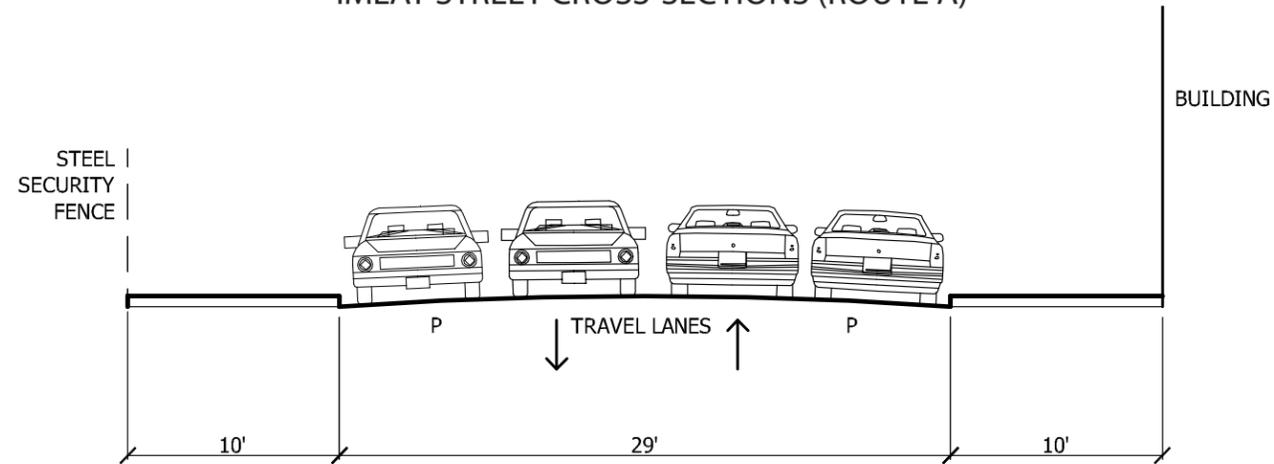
Existing configuration of Imlay Street north of Bowne Street
